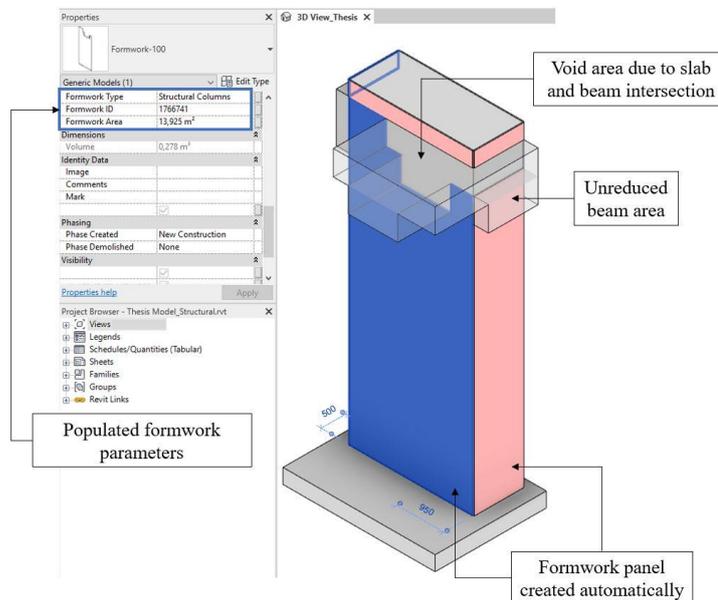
Rectangular column formwork panels and populated formwork parameters
